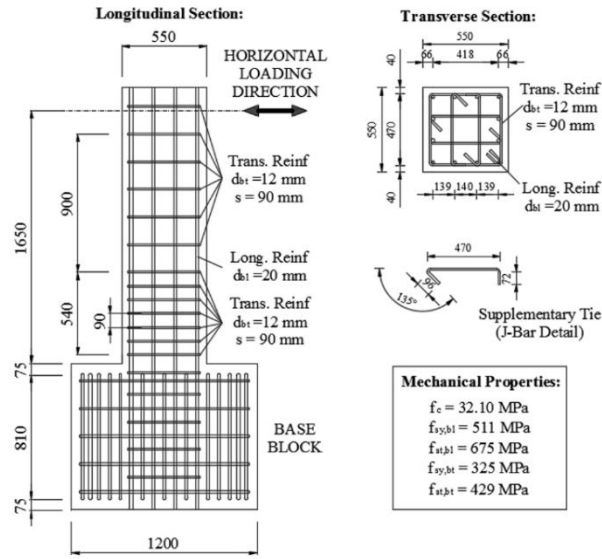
Geometrical, material and reinforcement details of specimen N7 tested by Tanaka and Park (1990).
